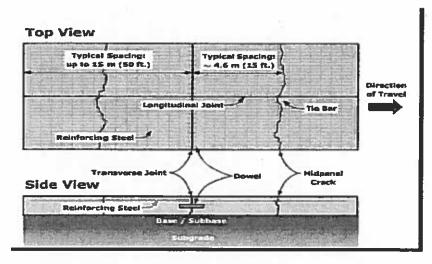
Jointed Reinforced Concrete Pavement (1/)
